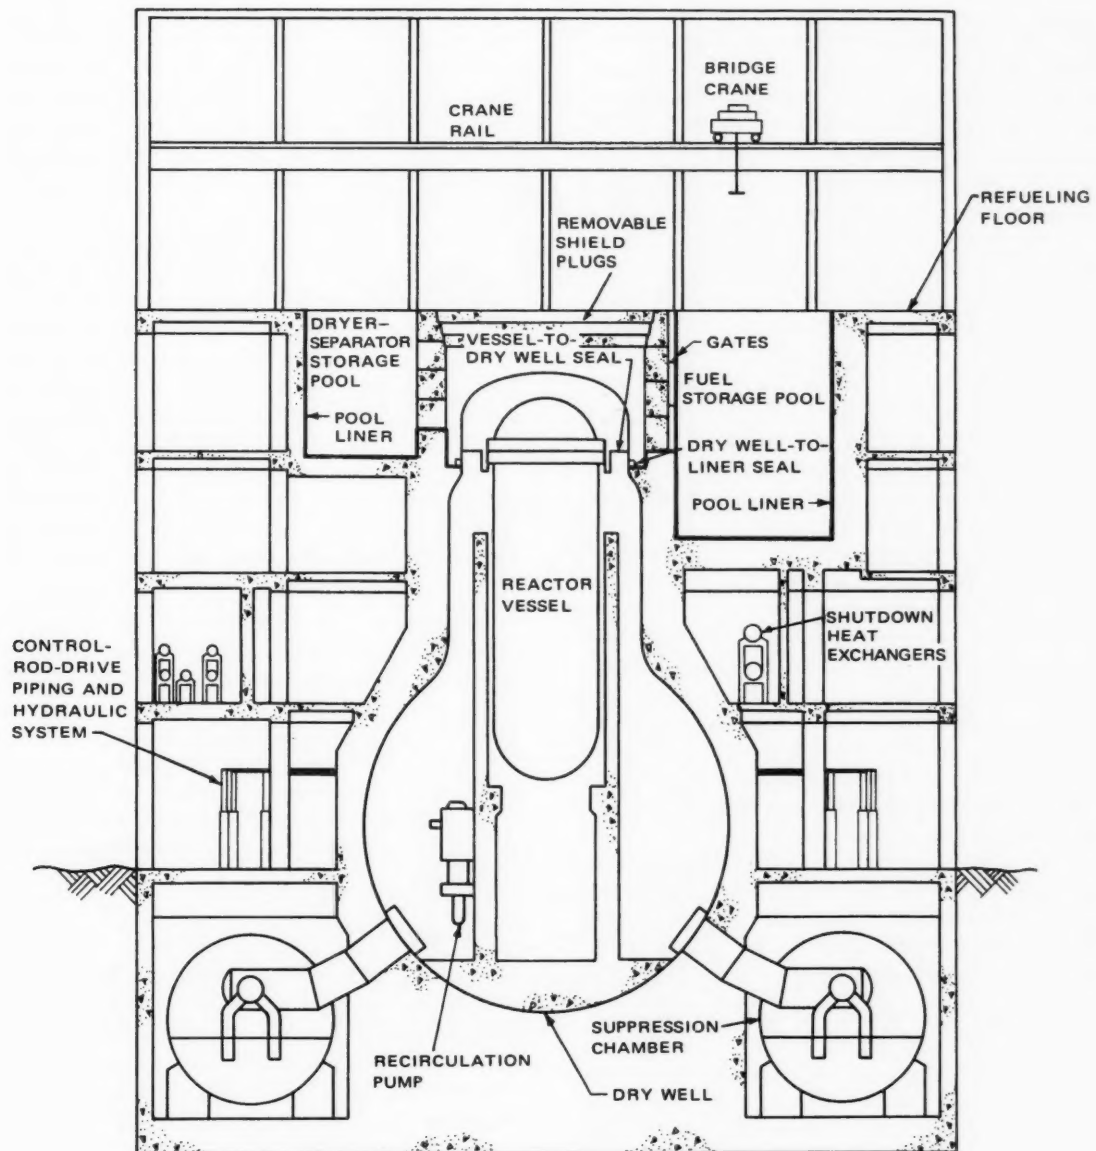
Typical arrangement of reactor building in a BWR plant.
